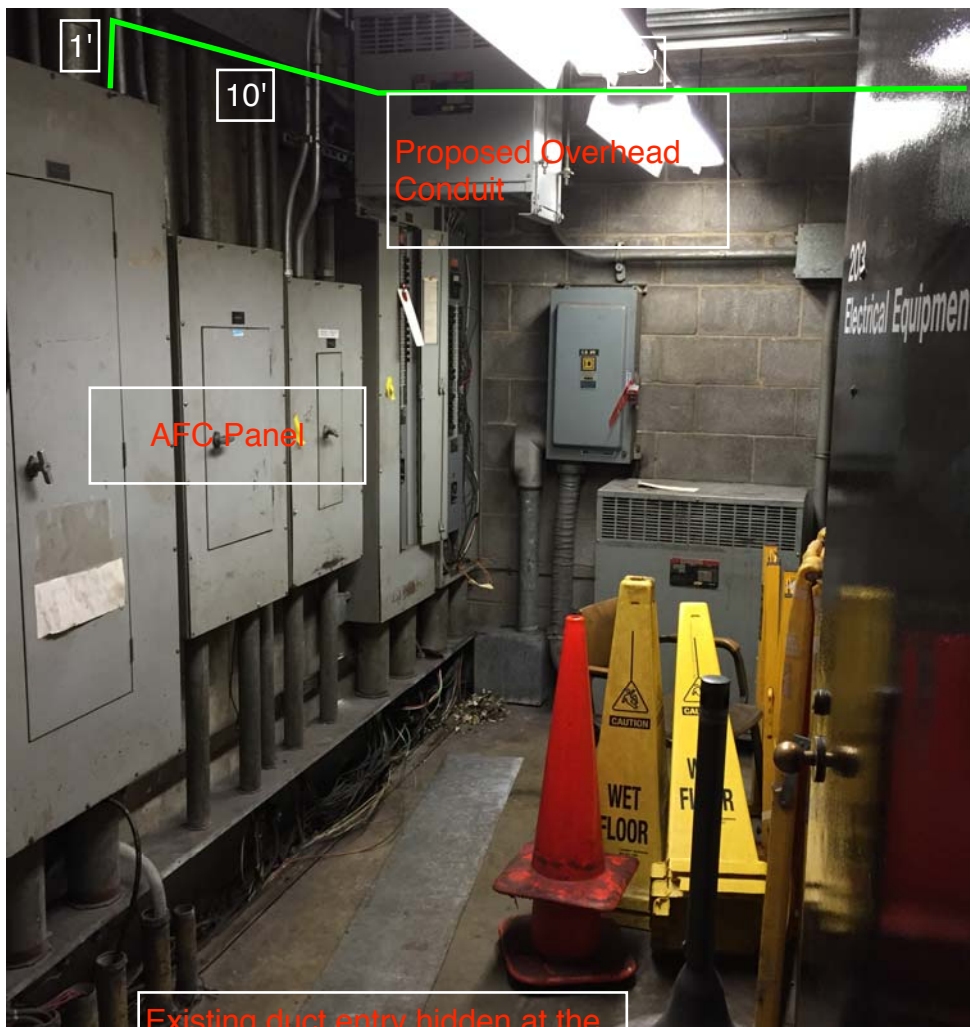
Existing duct and proposed overhead conduit in Electrical Room 203
